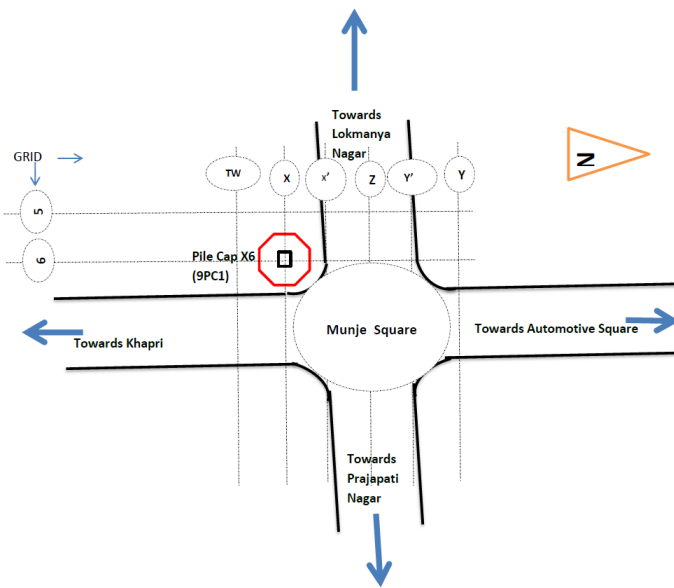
LAYOUT PLAN OF SITABULDI INTERCHANGE STATION
